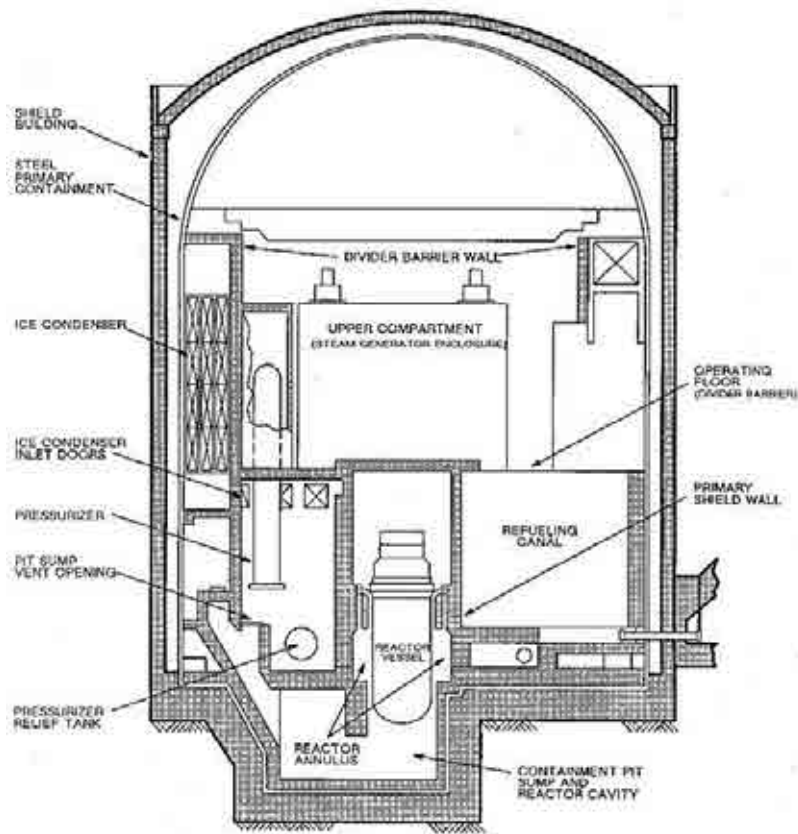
PWR ice condenser steel containment with concrete shield building [22].
